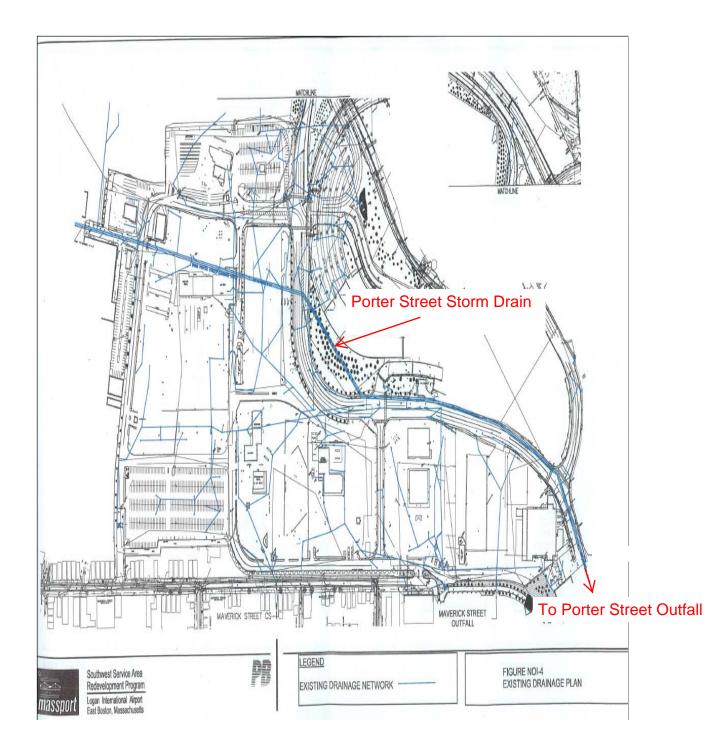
Massport Stormwater Outfall Locations (Maverick and Porter)
